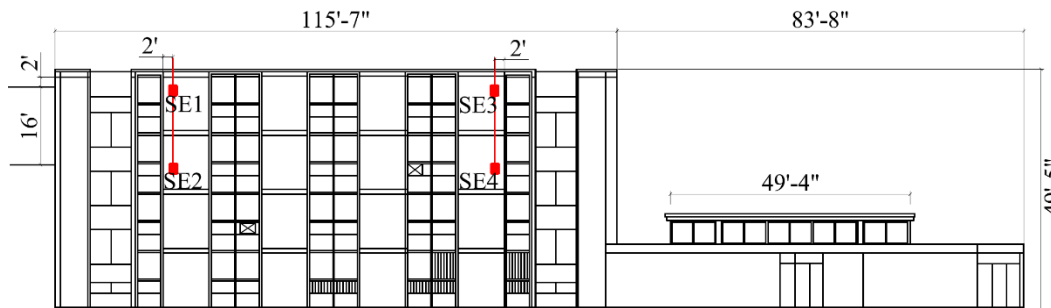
South-east elevation of HB Building with driving rain gauge locations
